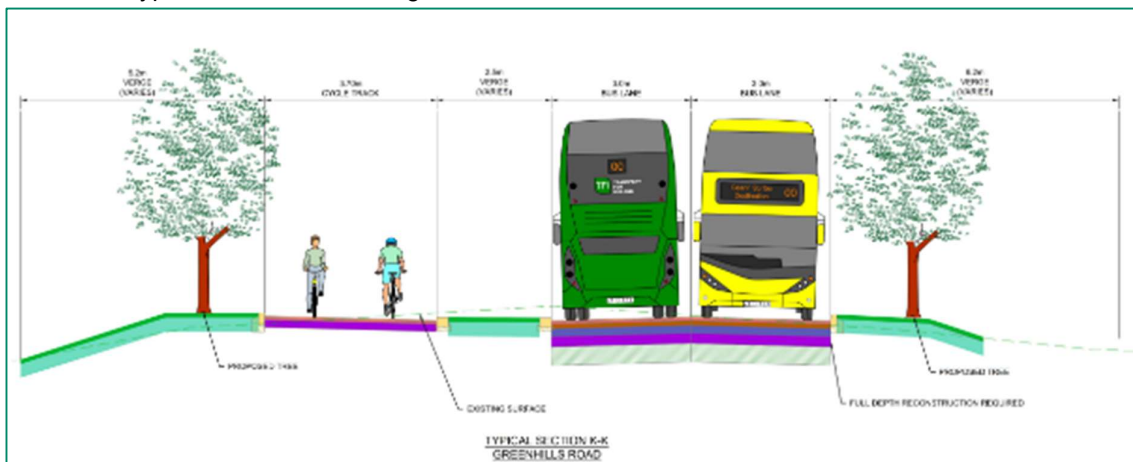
Extract from EIAR Typical Cross Sections Drawings (Sheet 6)
